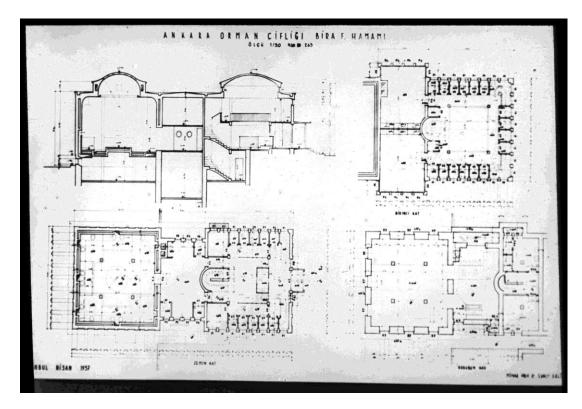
The drawings of AFF Brewery Bath, Ernst Egli, 1937 (Source: Alpagut, 2010)
